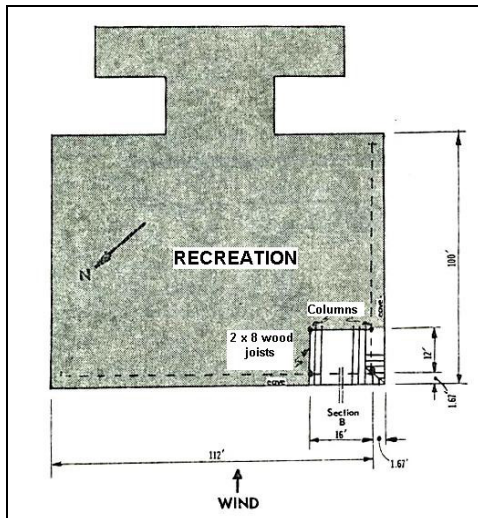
Roof plan diagram of the recreation building. The northwest corner of this roof was uplifted (not shaded). The roof was relatively flat and composed of wooden joists supported by steel beams and masonry walls.
